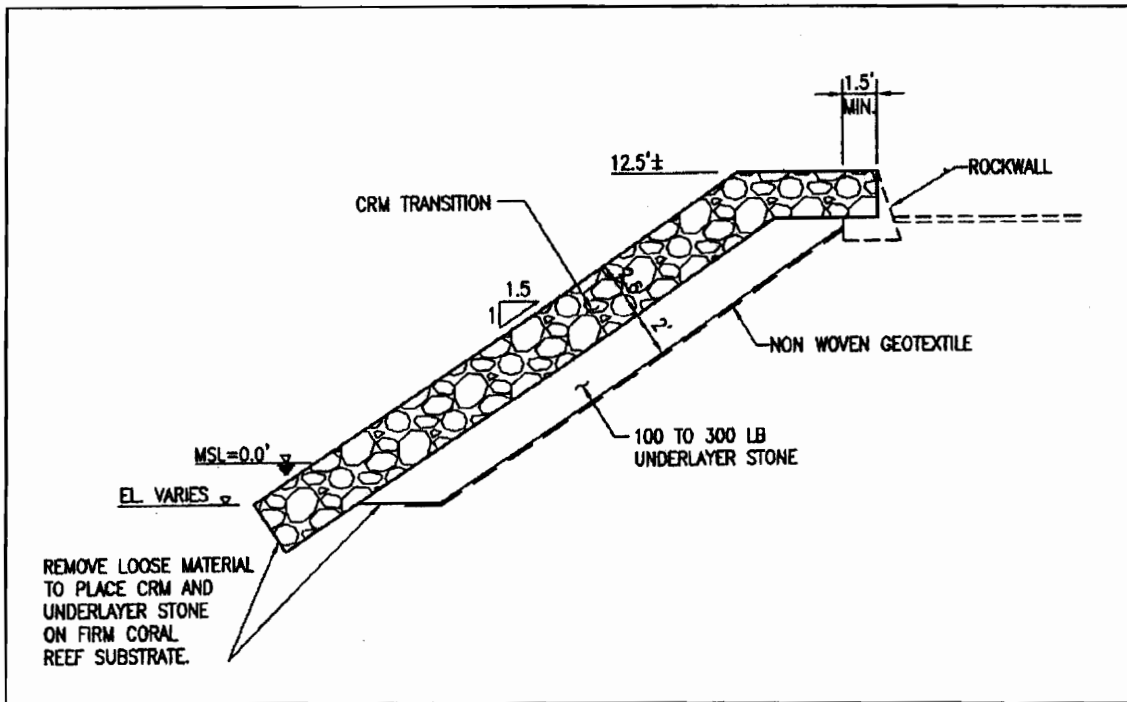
Project Plan, Sta .3+50 to Sta .6+39
